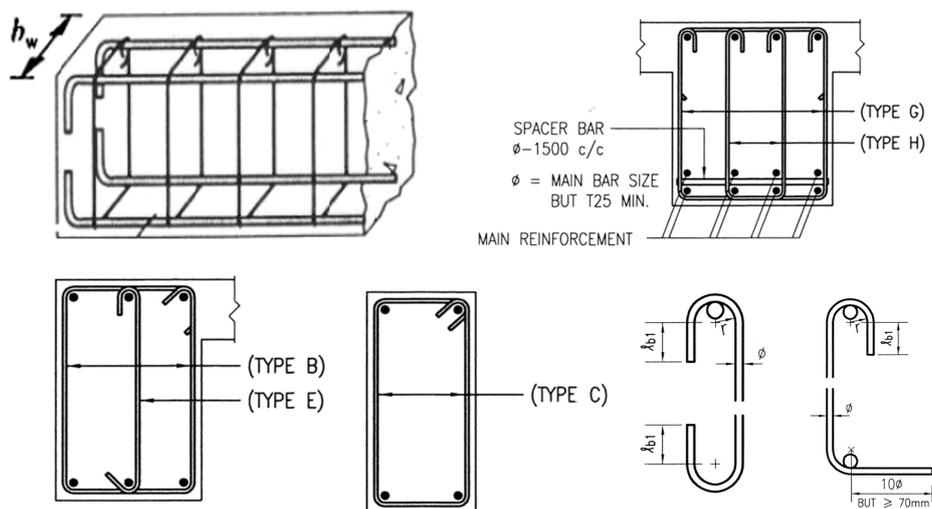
Shear reinforcement in a reinforced concrete beam.
